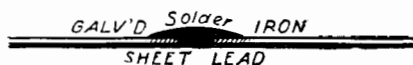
Soldering the Sheet Lead to the Galvanized Iron
